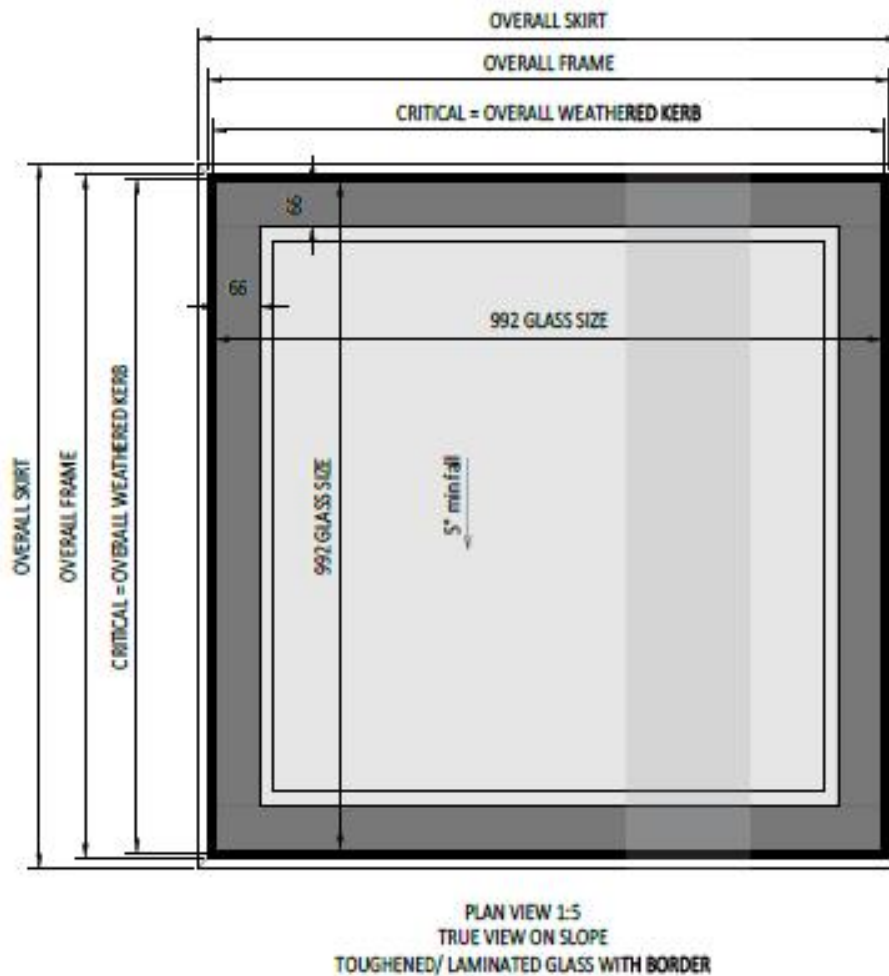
Drawing of Roofglaze Ltd Flatglass Rooflight
